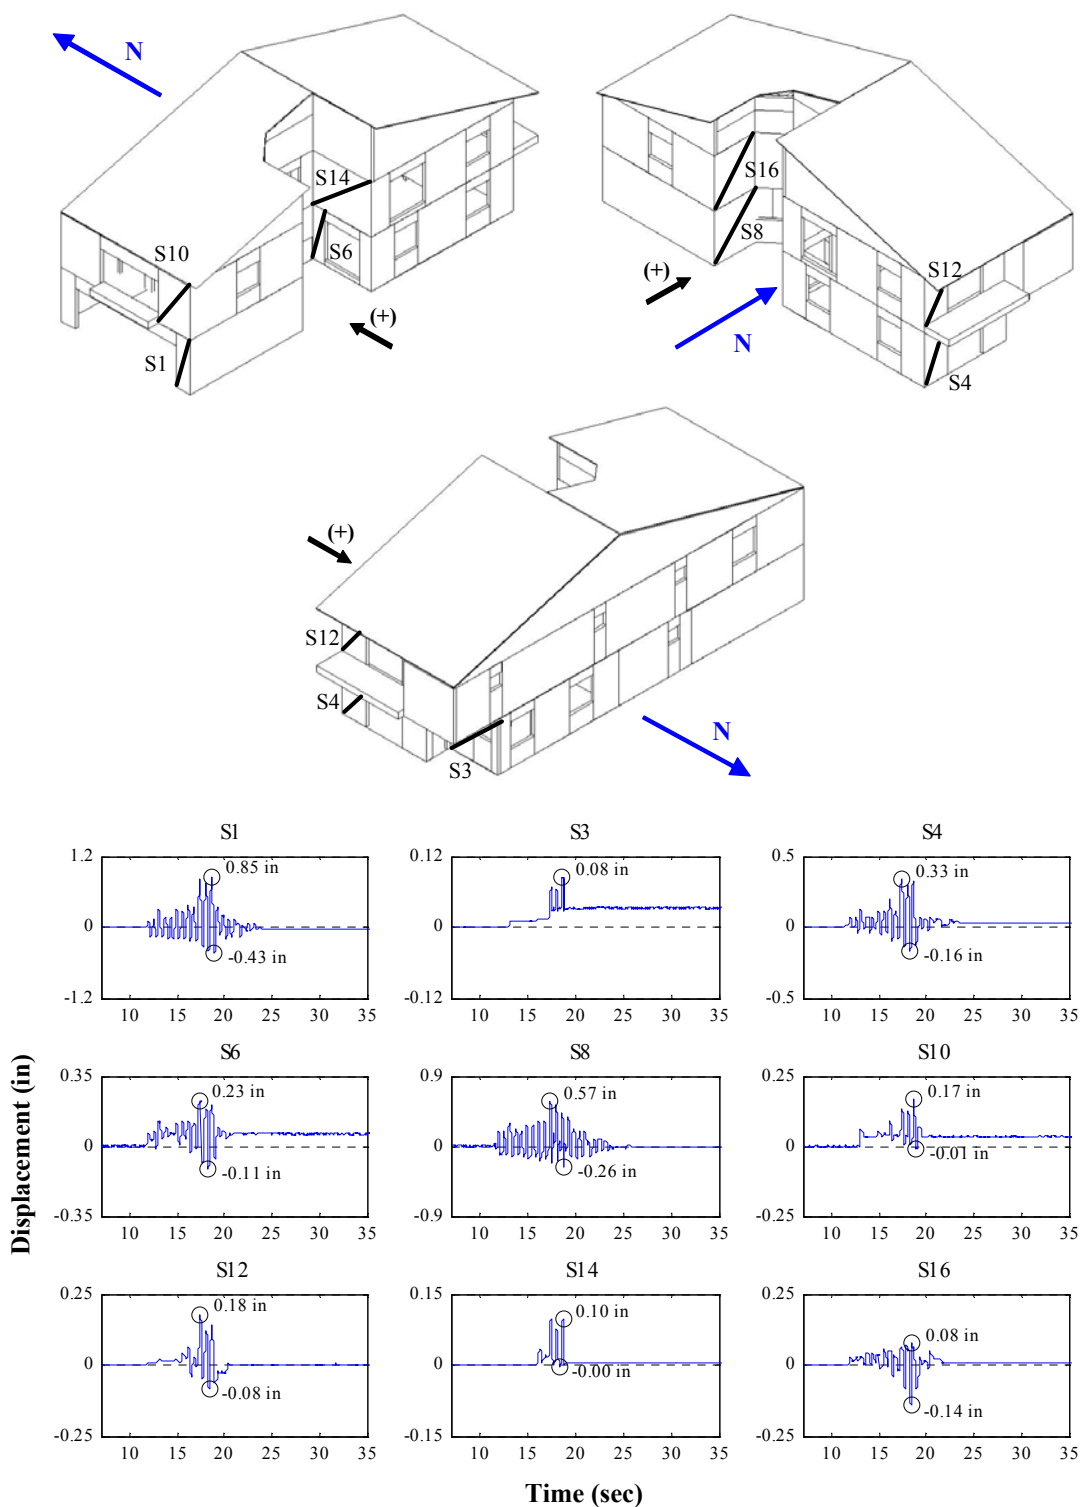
Wall deformations of north-south external walls for Test NWP3S04
